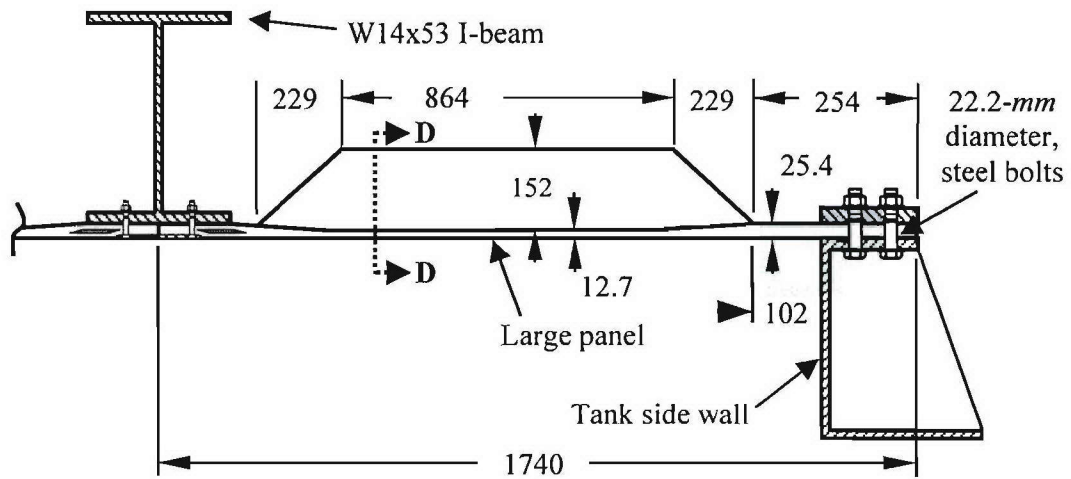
Geometry of the Large Panels - P03, Cross-Sectional View (in mm)
